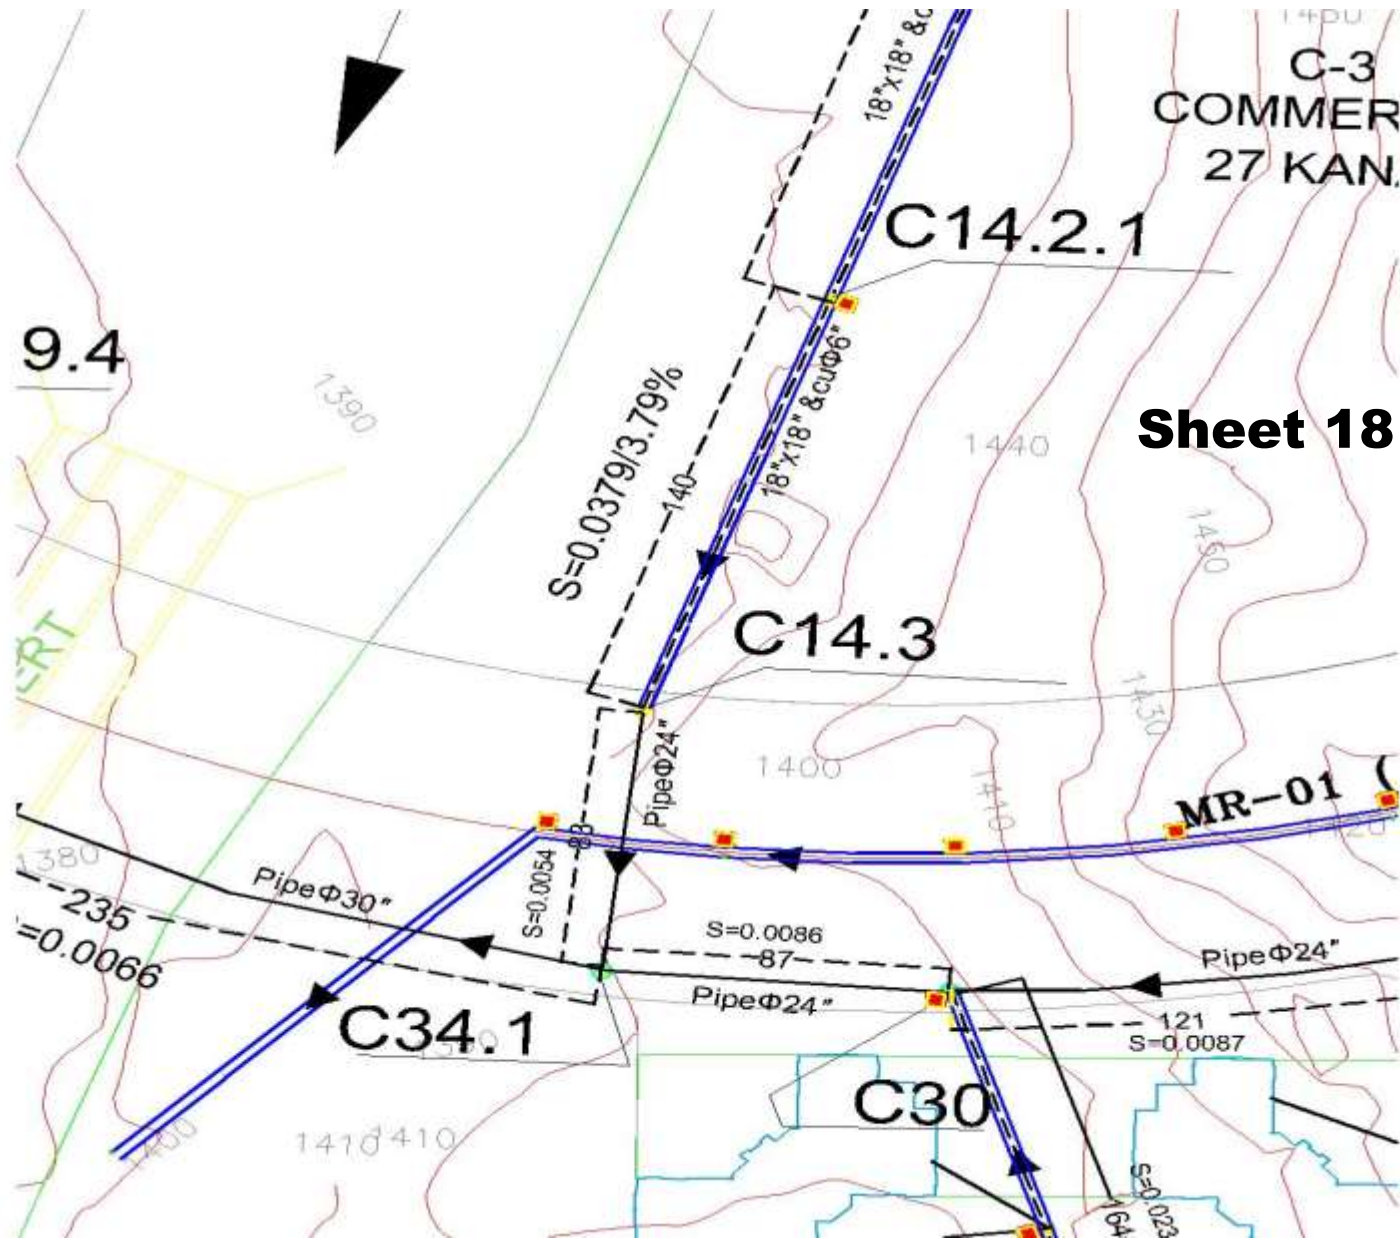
Combined drainage layout plan of Zone-3 from back side of commercial & M.I Room
